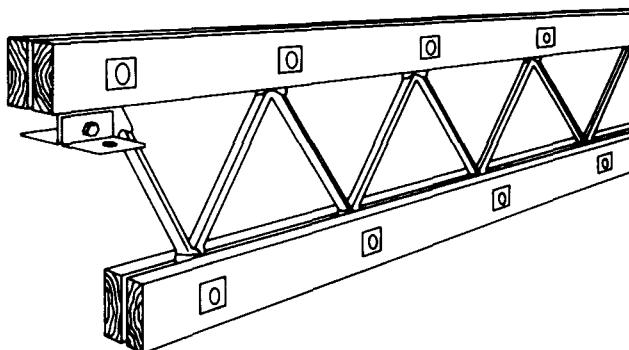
(b)(i)1 Wood bar joist construction.
